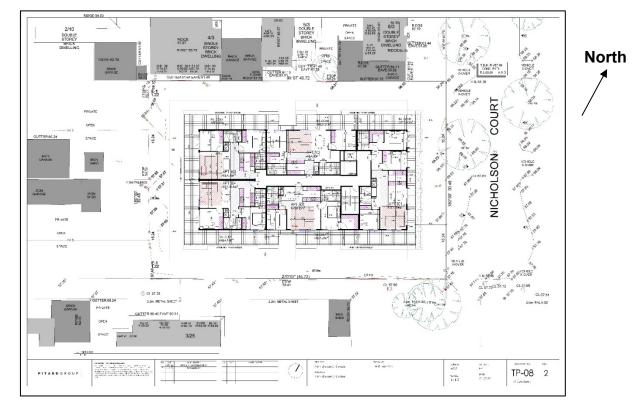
Level 3 floor plan of the proposed 7-9 Nicholson Court Development
